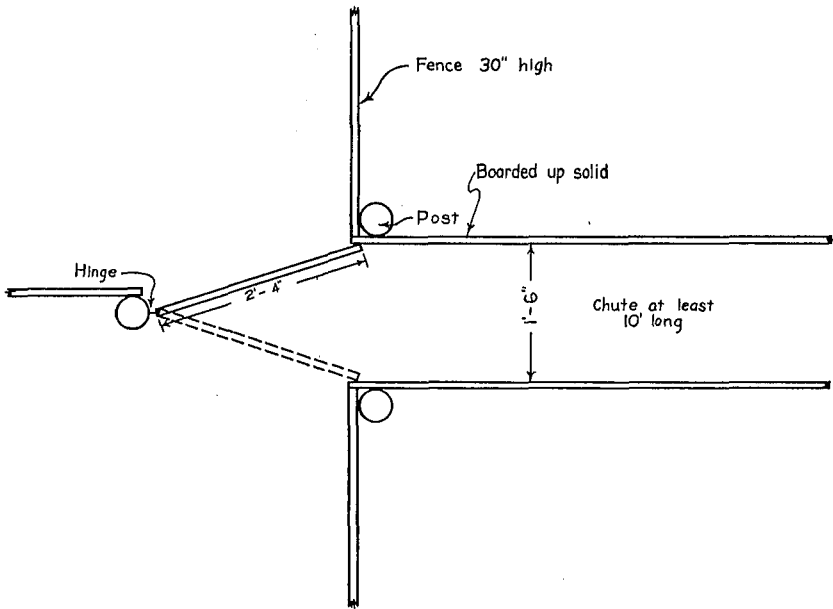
A sorting chute with a dodge gate is essential to handle a large flock rapidly. These are easily and cheaply constructed. Such a chute is very handy for sorting out top lambs for market or cutting out sheep from the flock.
